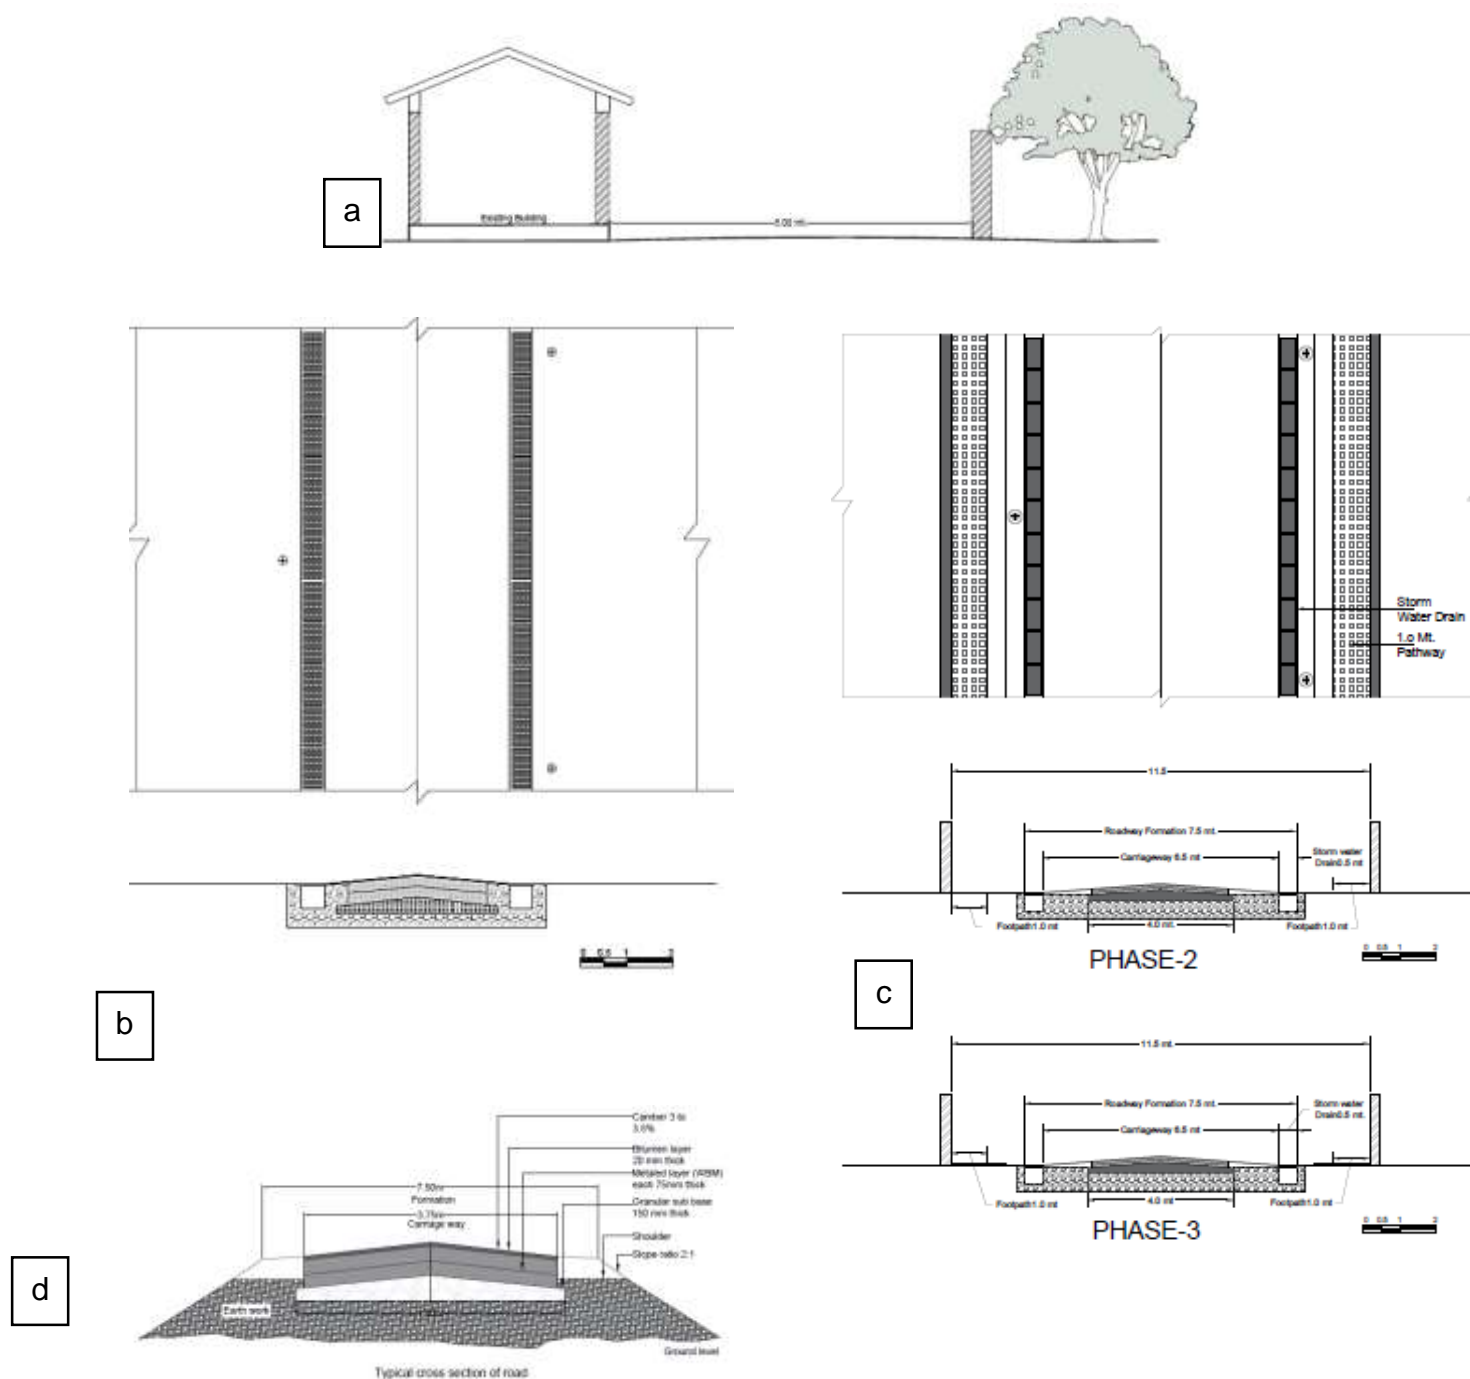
a) Existing Mud Road Condition, (b) Proposal for Phase 1, (c) Proposal for Phase 2 & Phase 3, (d) Typical Cross section of Road Design. (Source: Author)
